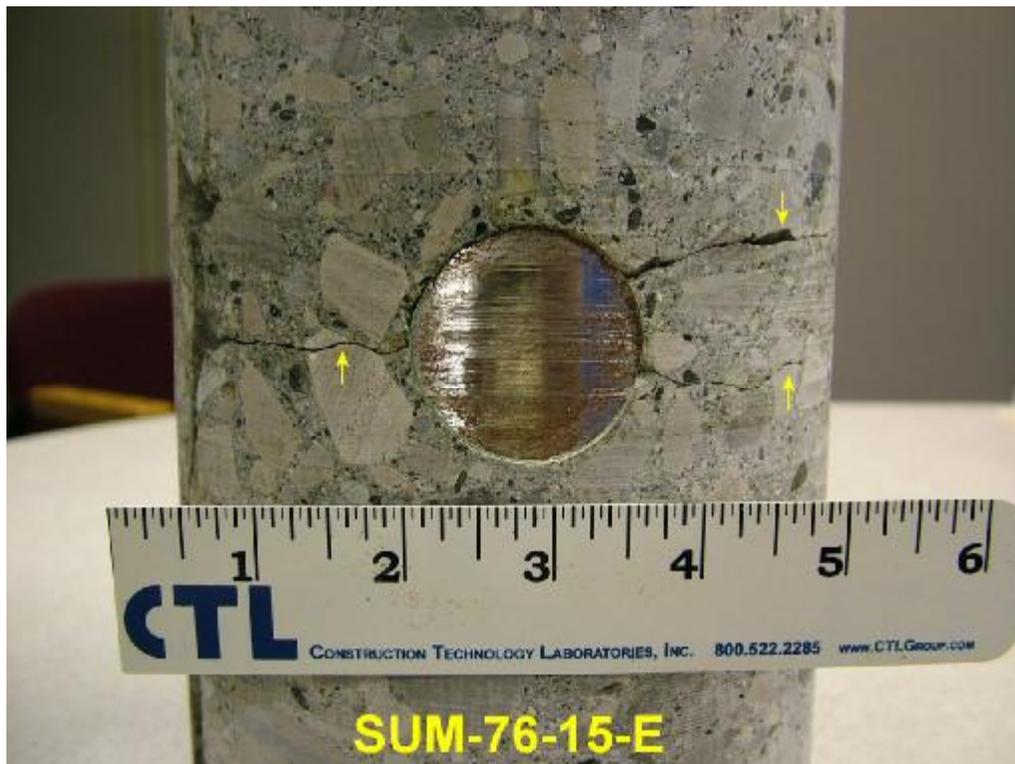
One of the cores taken from a control joint on the eastbound lanes of the Summit County I-76 project showing what is being referred to as “horizontal cracking” at the dowel level. This type of cracking is not present in the joint cores taken from the westbound I-76 lanes.
